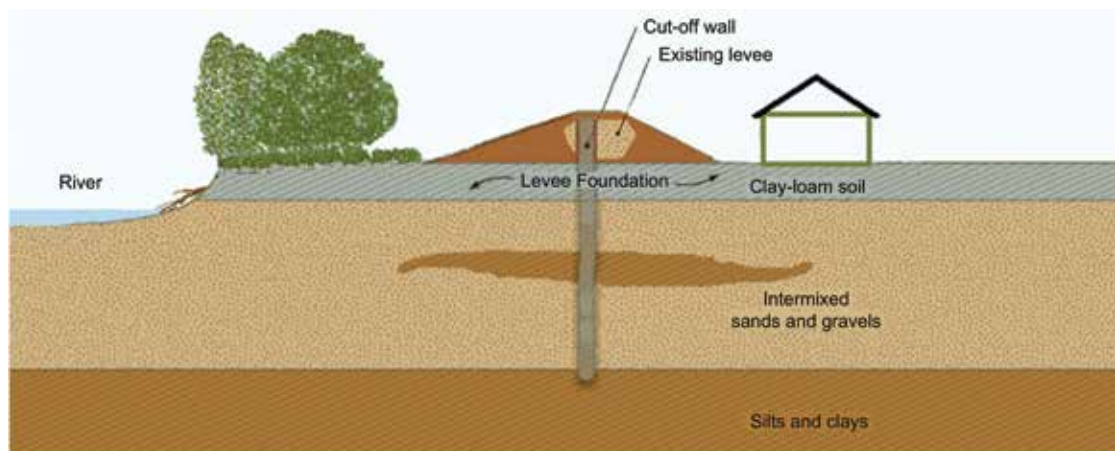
Slurry cut-off wall through levee and foundation to prevent seepage-related instability (courtesy Mary Perlea, USACE)
